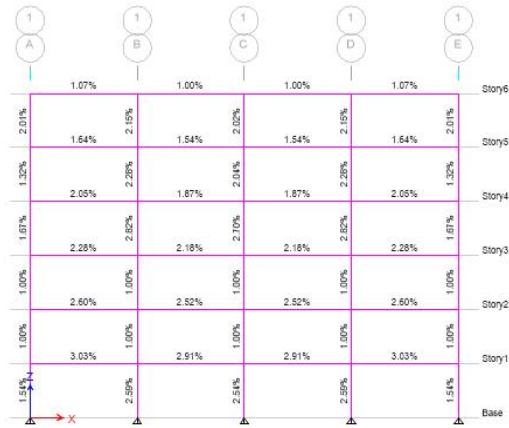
Output Design of the 6-Story Structural Building Showing the Required Reinforcement Area (mm) with Beam A (40cmX45cm),Beam B (30cmX40cm).
